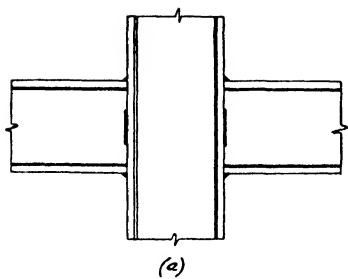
RIGID BEAM-TO-COLUMN CONNECTIONS
